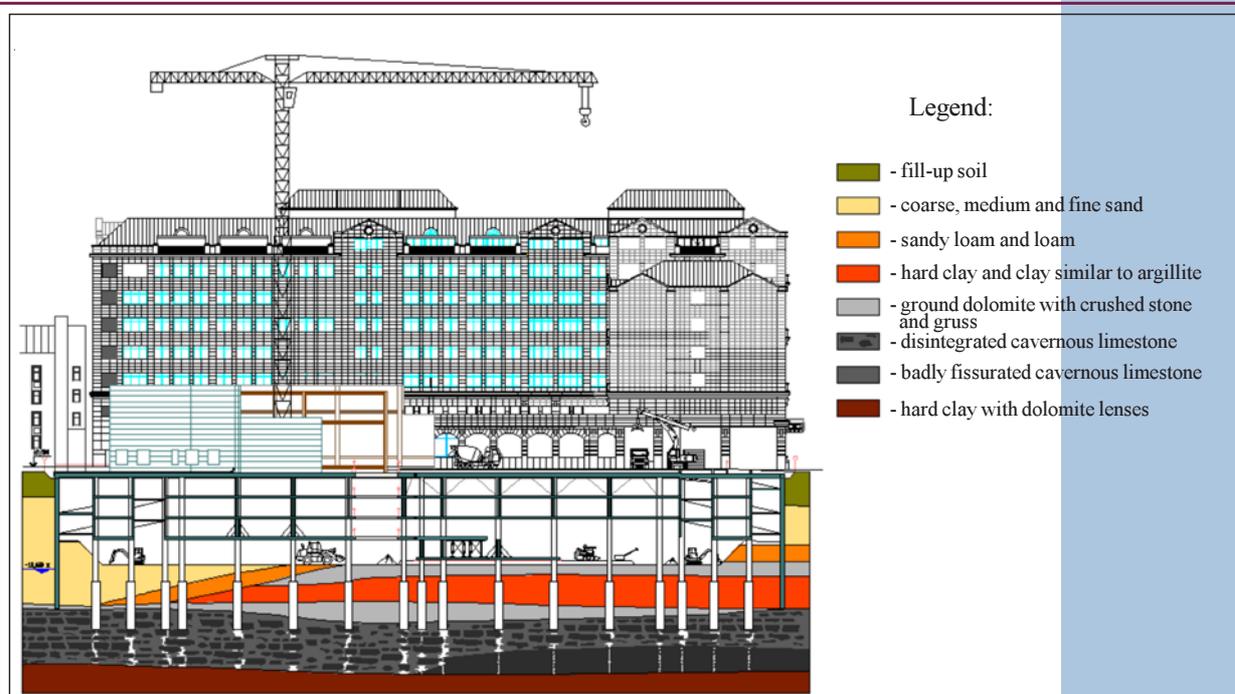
«The Alfa-Arbat-Center» multifunctional complex in Moscow. Erecting floor-slabs over the parking-garage western half -4th and -5th stores as well as the western half -3rd storey internal bearing structures. Excavation in the pit 4th tier under protection of the -3rd storey ramp structures at both parts of the parking-garage. Proceeding with erection of the extension.
